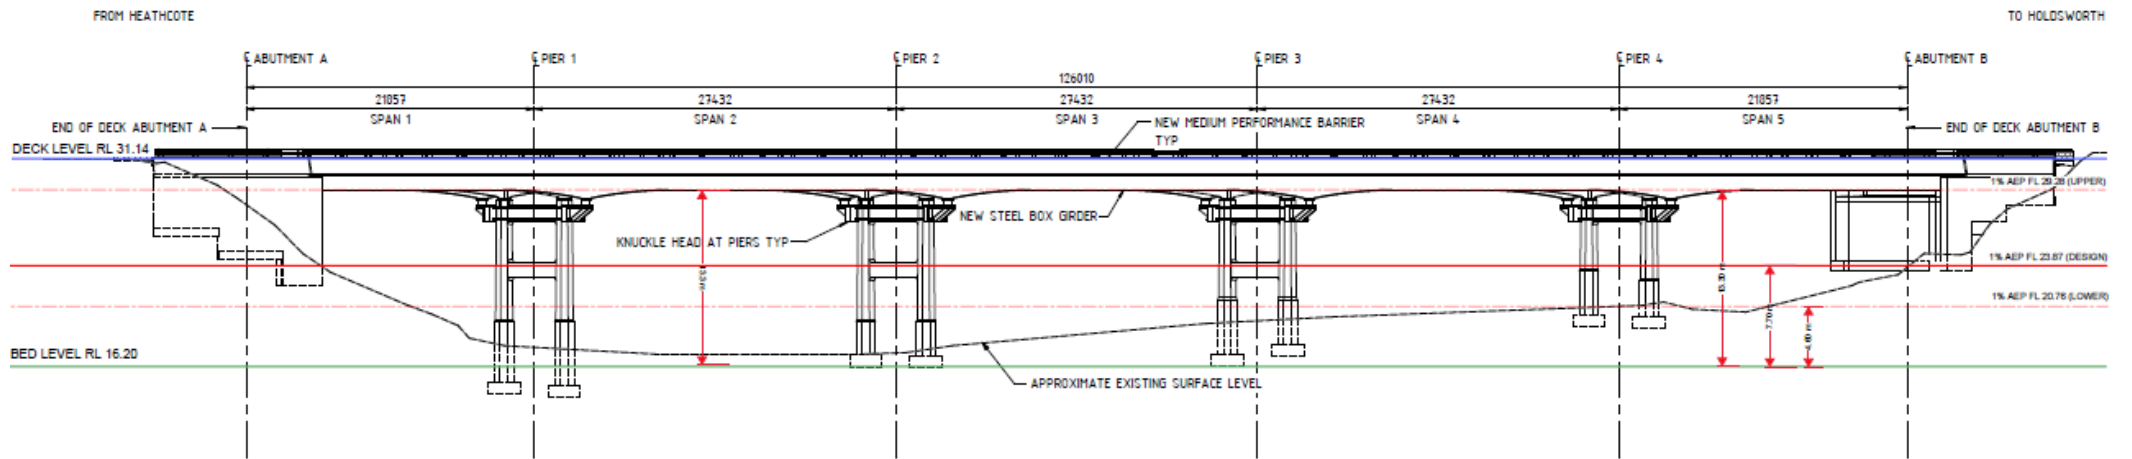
Elevation of proposed bridge structure compared to 1% AEP flood level
